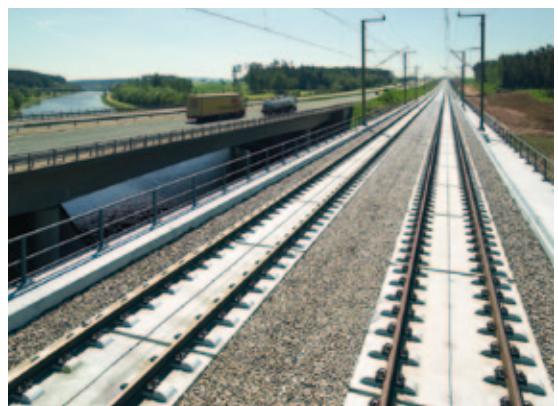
/2, New railway line Nuremberg – Ingolstadt, ballastless track, station tracks with ballasted superstructure, civil works on the line, railway bridge, earthworks and embankments, passenger transport installations, cable engineering, noise barriers, retaining structures
